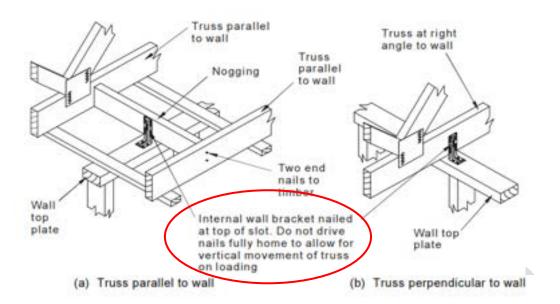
FIXING OF TRUSSES TO FREESTANDING NON-LOADBEARING WALL
